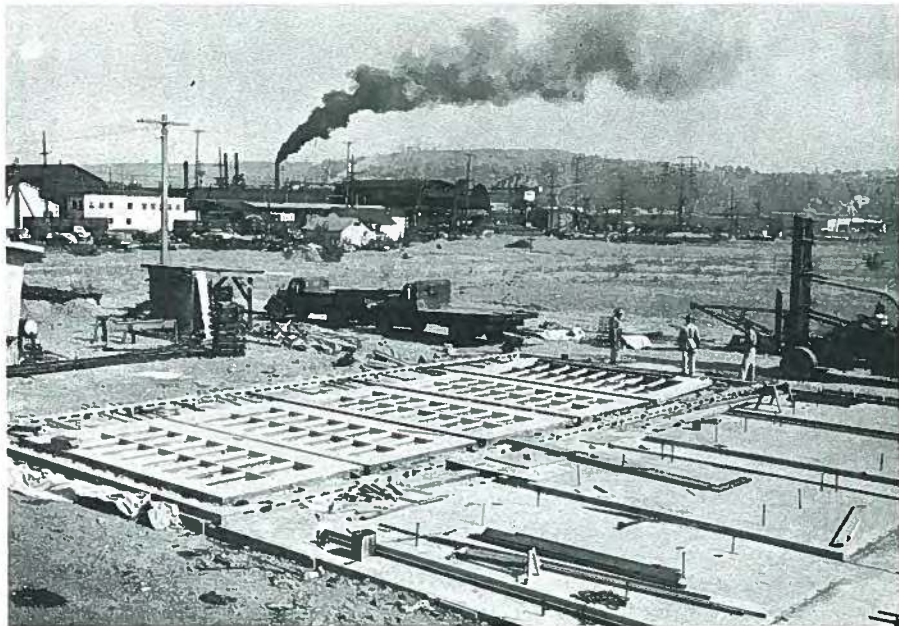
Outdoor casting yard for Concrete Engineering Company (1951). Note that the window frames, which were cast on the floor slab, were prestressed in both directions simultaneously.
